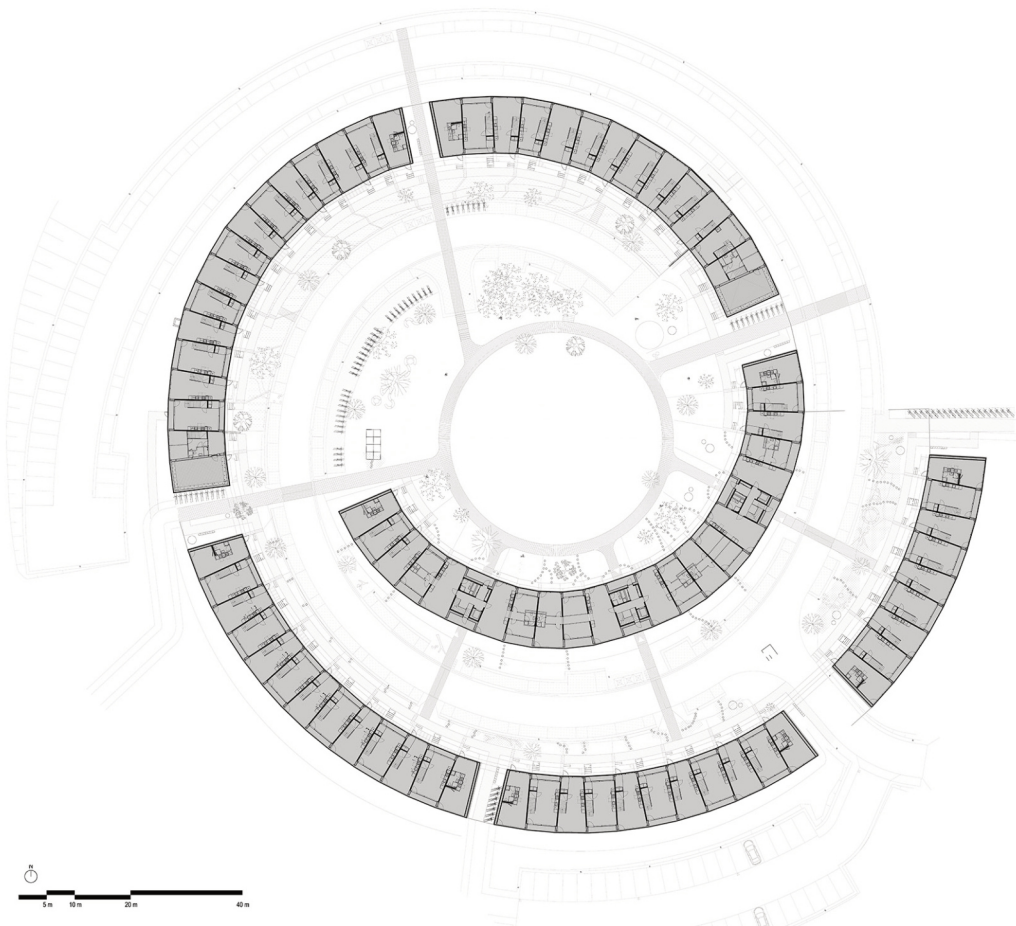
Sneglehusene Ground Floor Plan (BIG)
